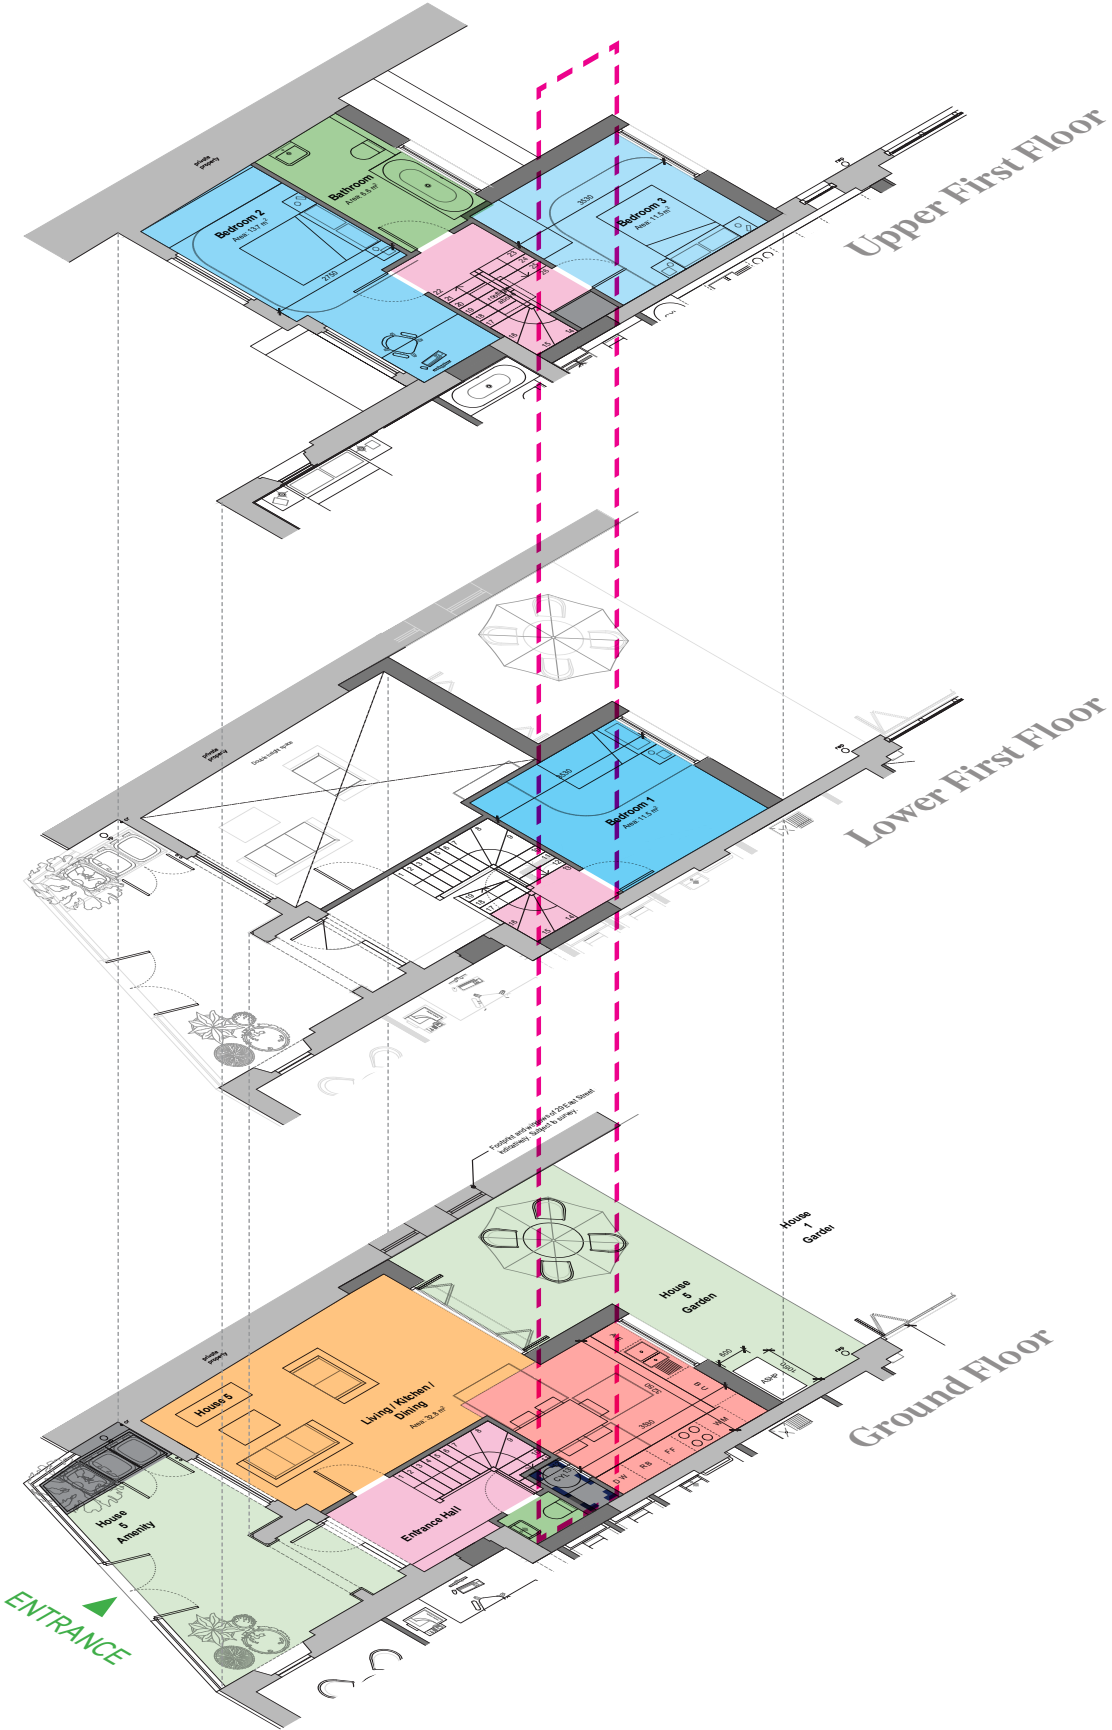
Houses 5 - Isometric diagram indicating general floor plan arrangement.
